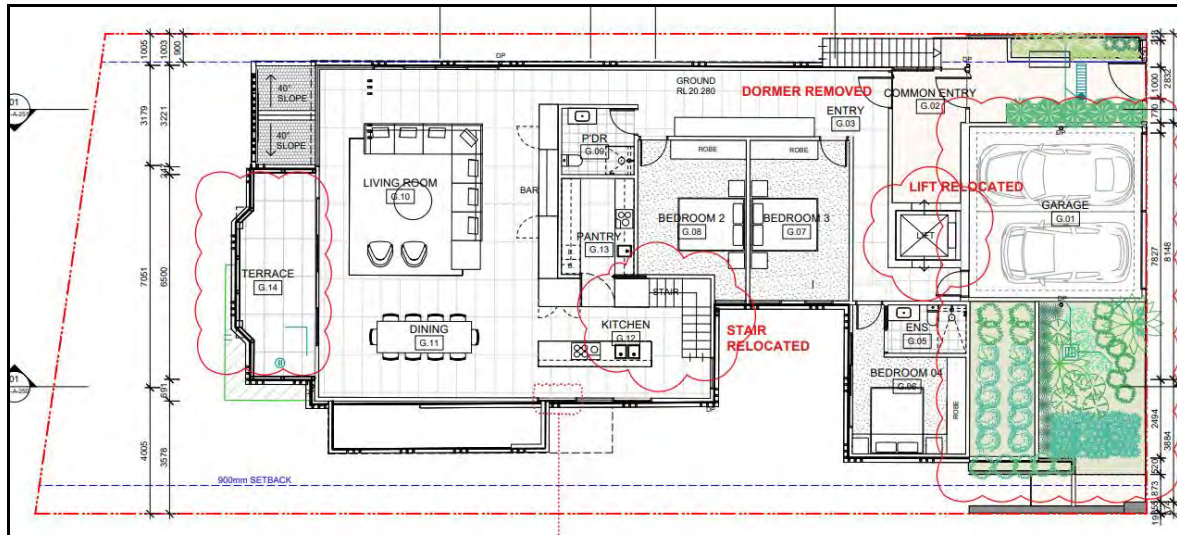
Proposed Upper Ground Floor Plan, DA-A-101 Rev L
